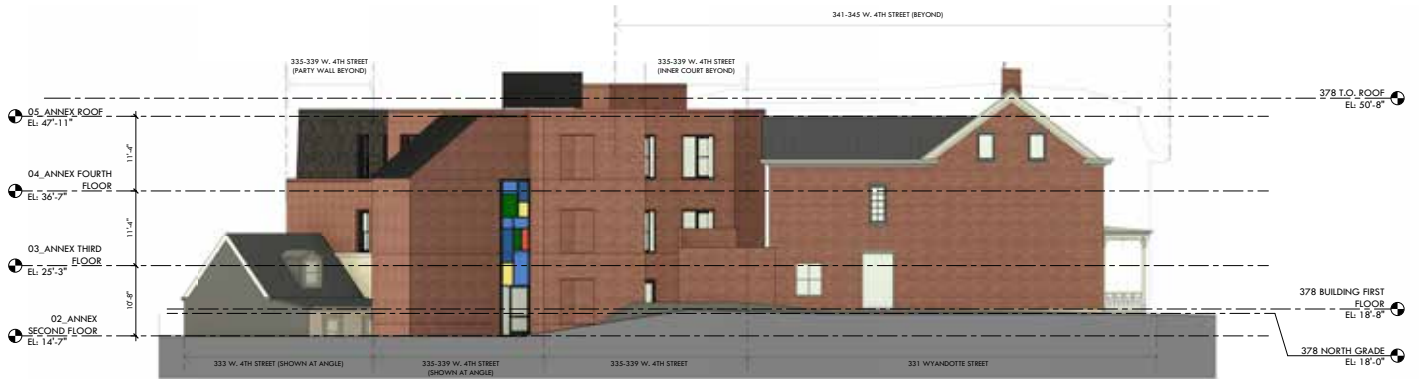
Proposed 335-339 West Fourth Street and adjacent buildings, North Elevation, Bethlehem, PA; Drawn by Spillman Farmer Architects
